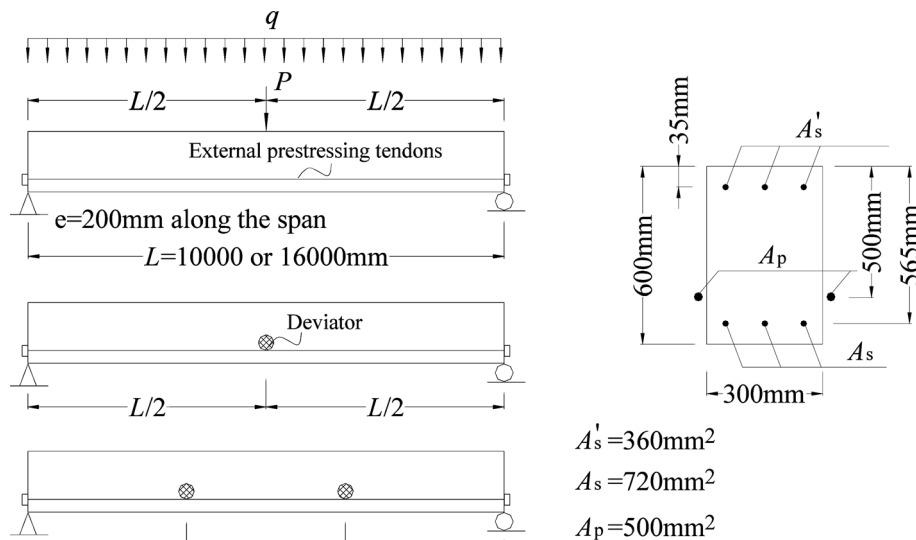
Details of externally prestressed concrete beams used for second-order effect analysis
